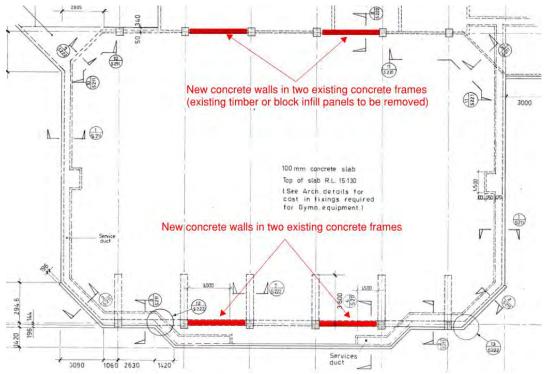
Gymnasium Floor Plan - Strengthening to Achieve 67% DBE
